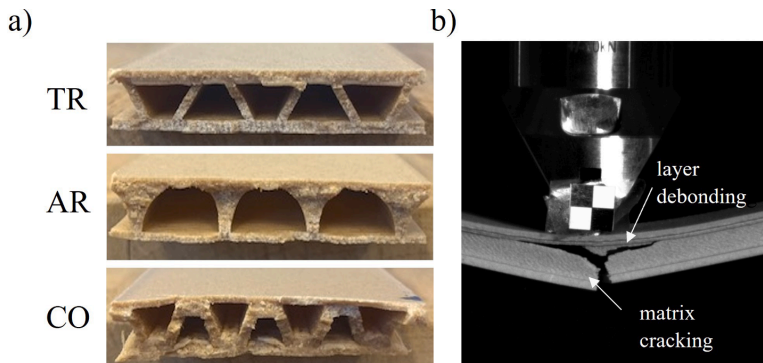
a) Fracture surface of TR, AR and CO sandwich panels after the 3-point bending test and b) DIC image of sample CO under 3-point bending loading at the time of fracture.
